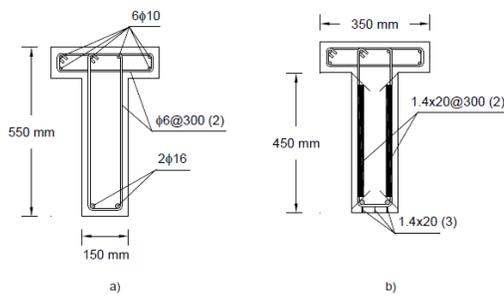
T-beam cross section geometry, a) before and b) after CFRP laminate strengthening.
